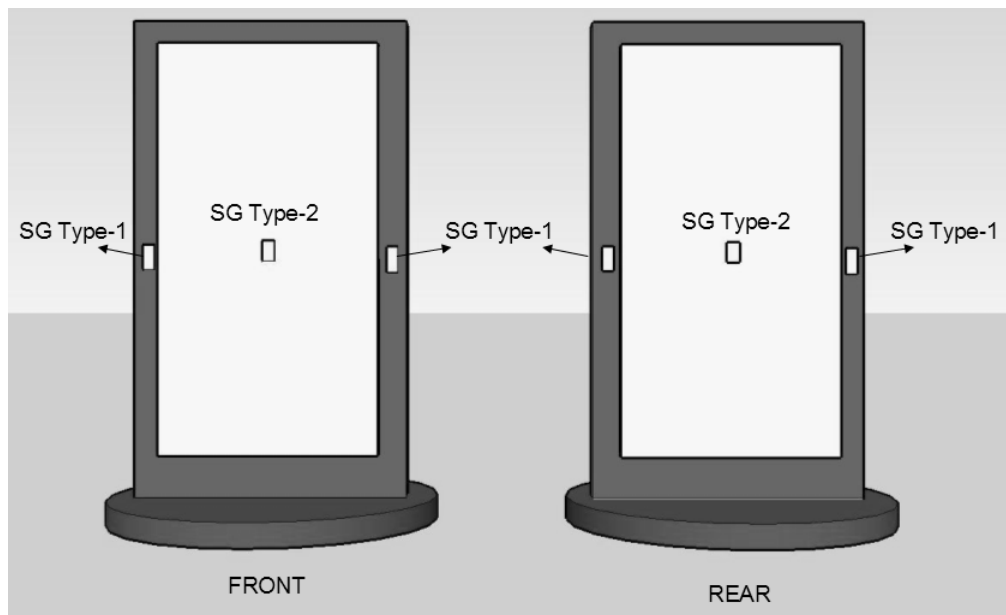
Strain-Gauge Locations on Steel Plate Specimens
